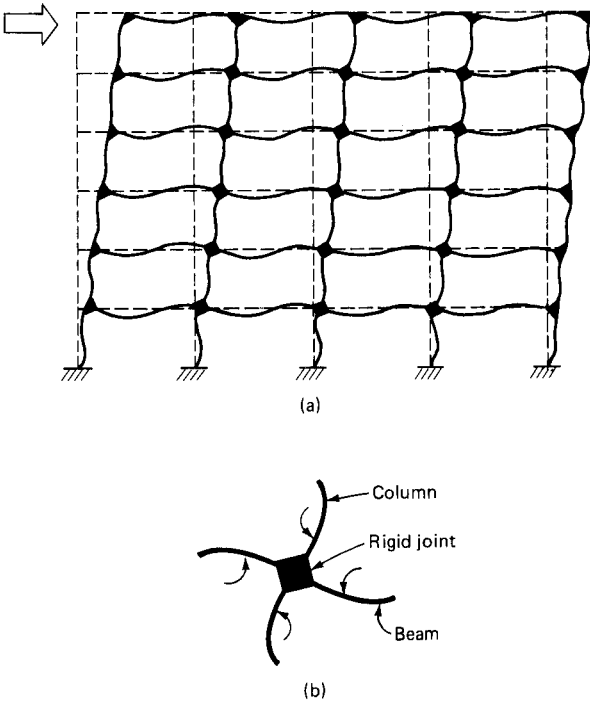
(a) Response of rigid frame to lateral loads; (b) flexural deformation of beams and columns due to nondeformability of connection.
